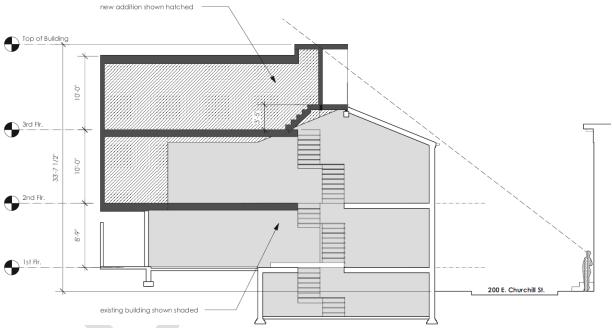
223 E. Churchill Street - Building Section - Sightline Study
